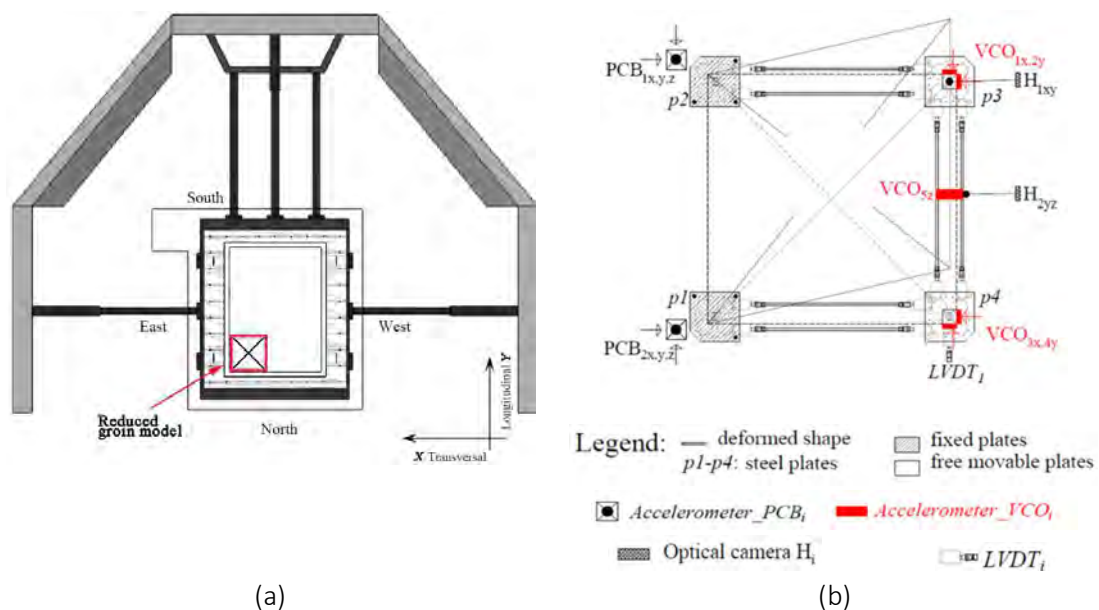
Shaking table: (a) plan with the location of the model; (b) Instrumentation setup: top view
